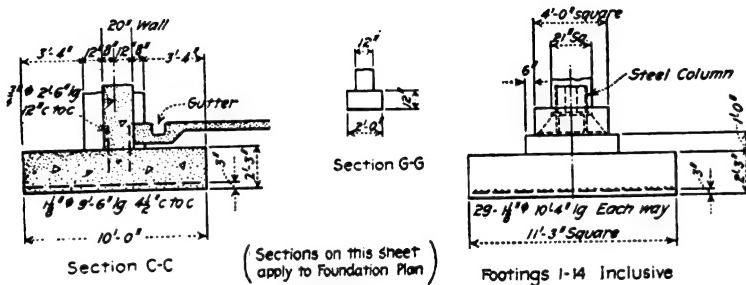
B.—Winchester Repeating Arms Co.'s building, New Haven, Conn.
